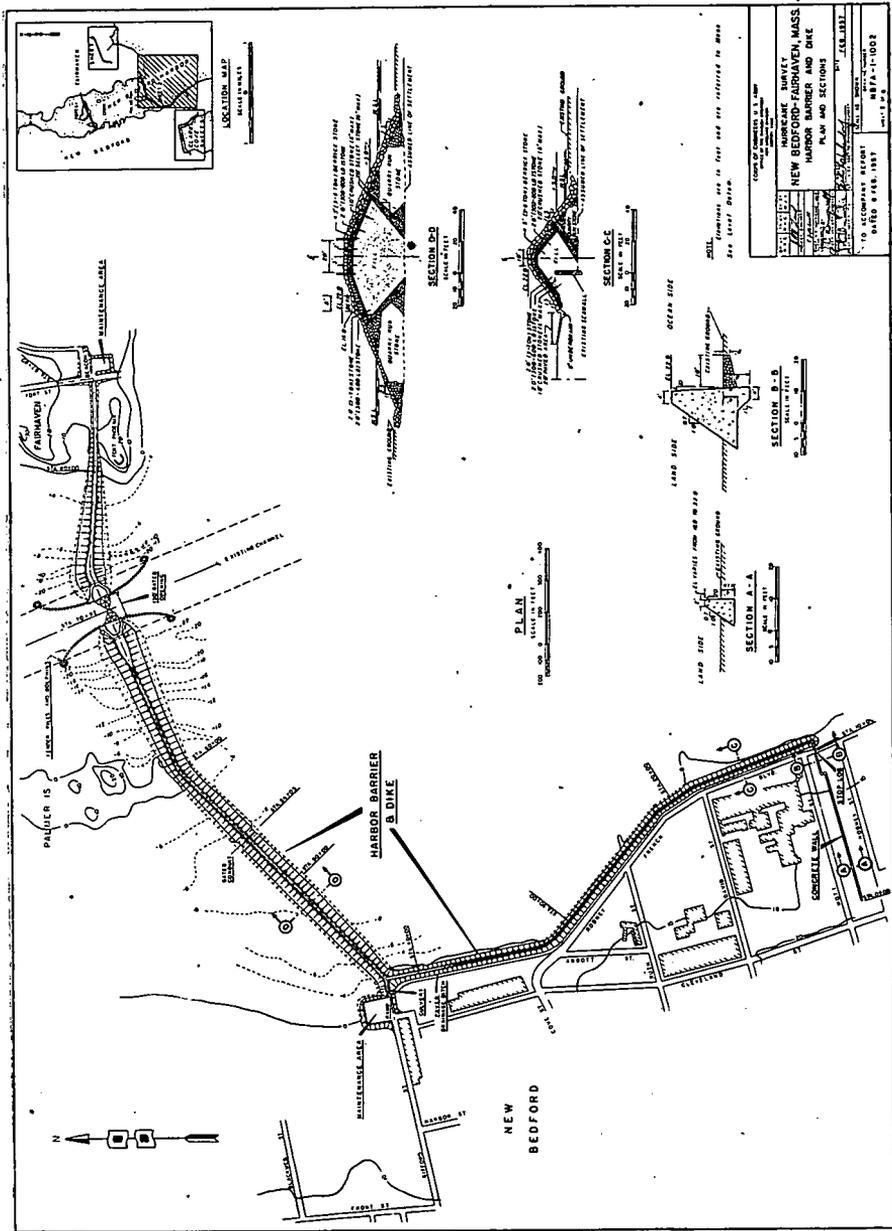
HARBOR BARRIER AND DIKE, PLAN 'F'.
